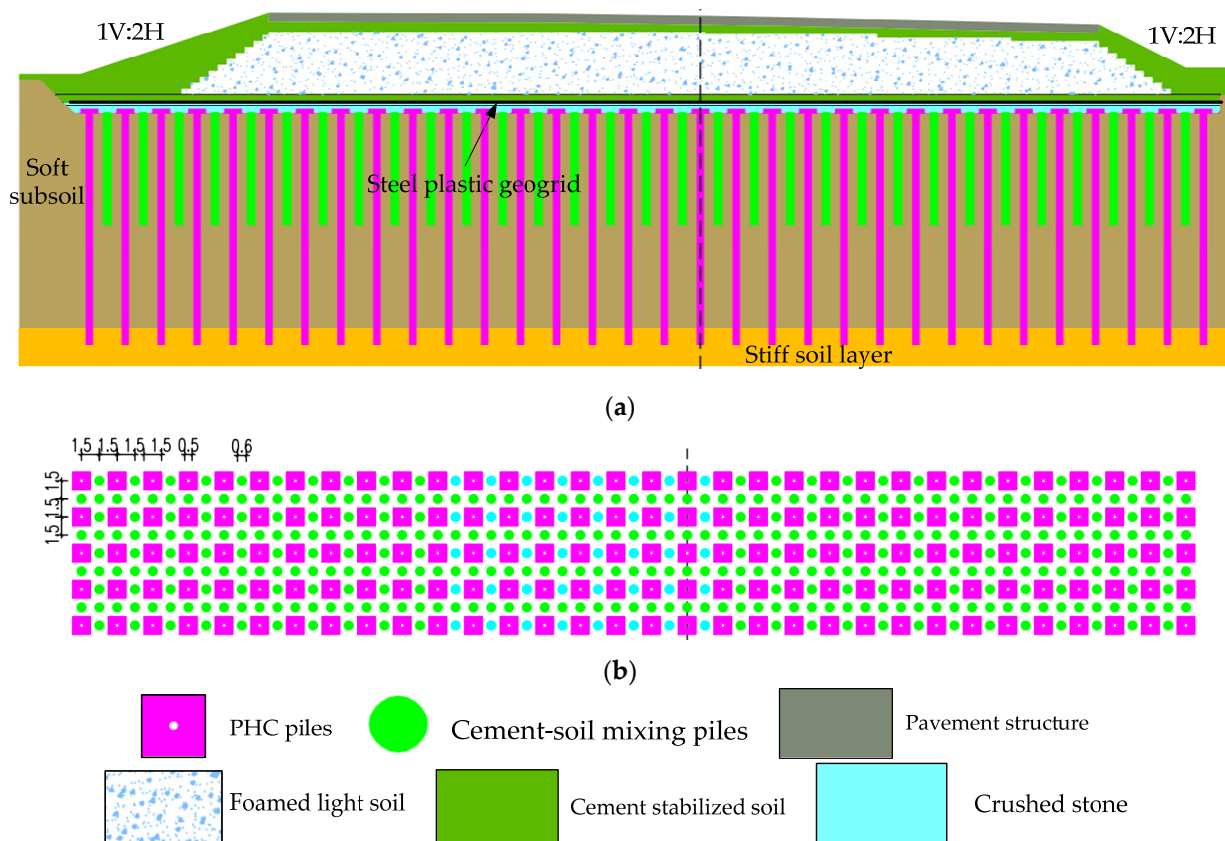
Reinforcement diagram of pile-net composite foundation embankment in the PHC test section: (a) Cross section. (b) Pile location layout.
